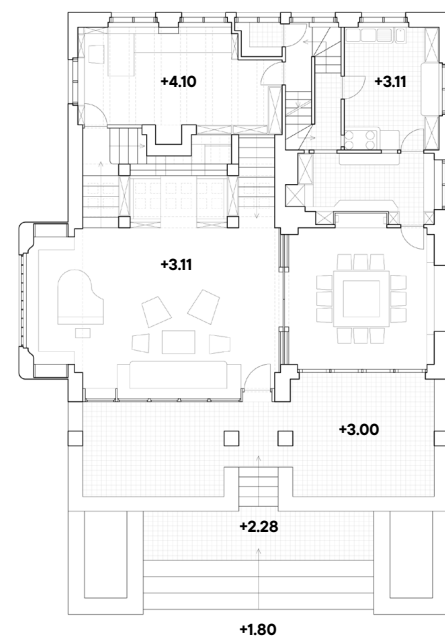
Floor Height in Villa Holzner (Ground Floor Plan)
